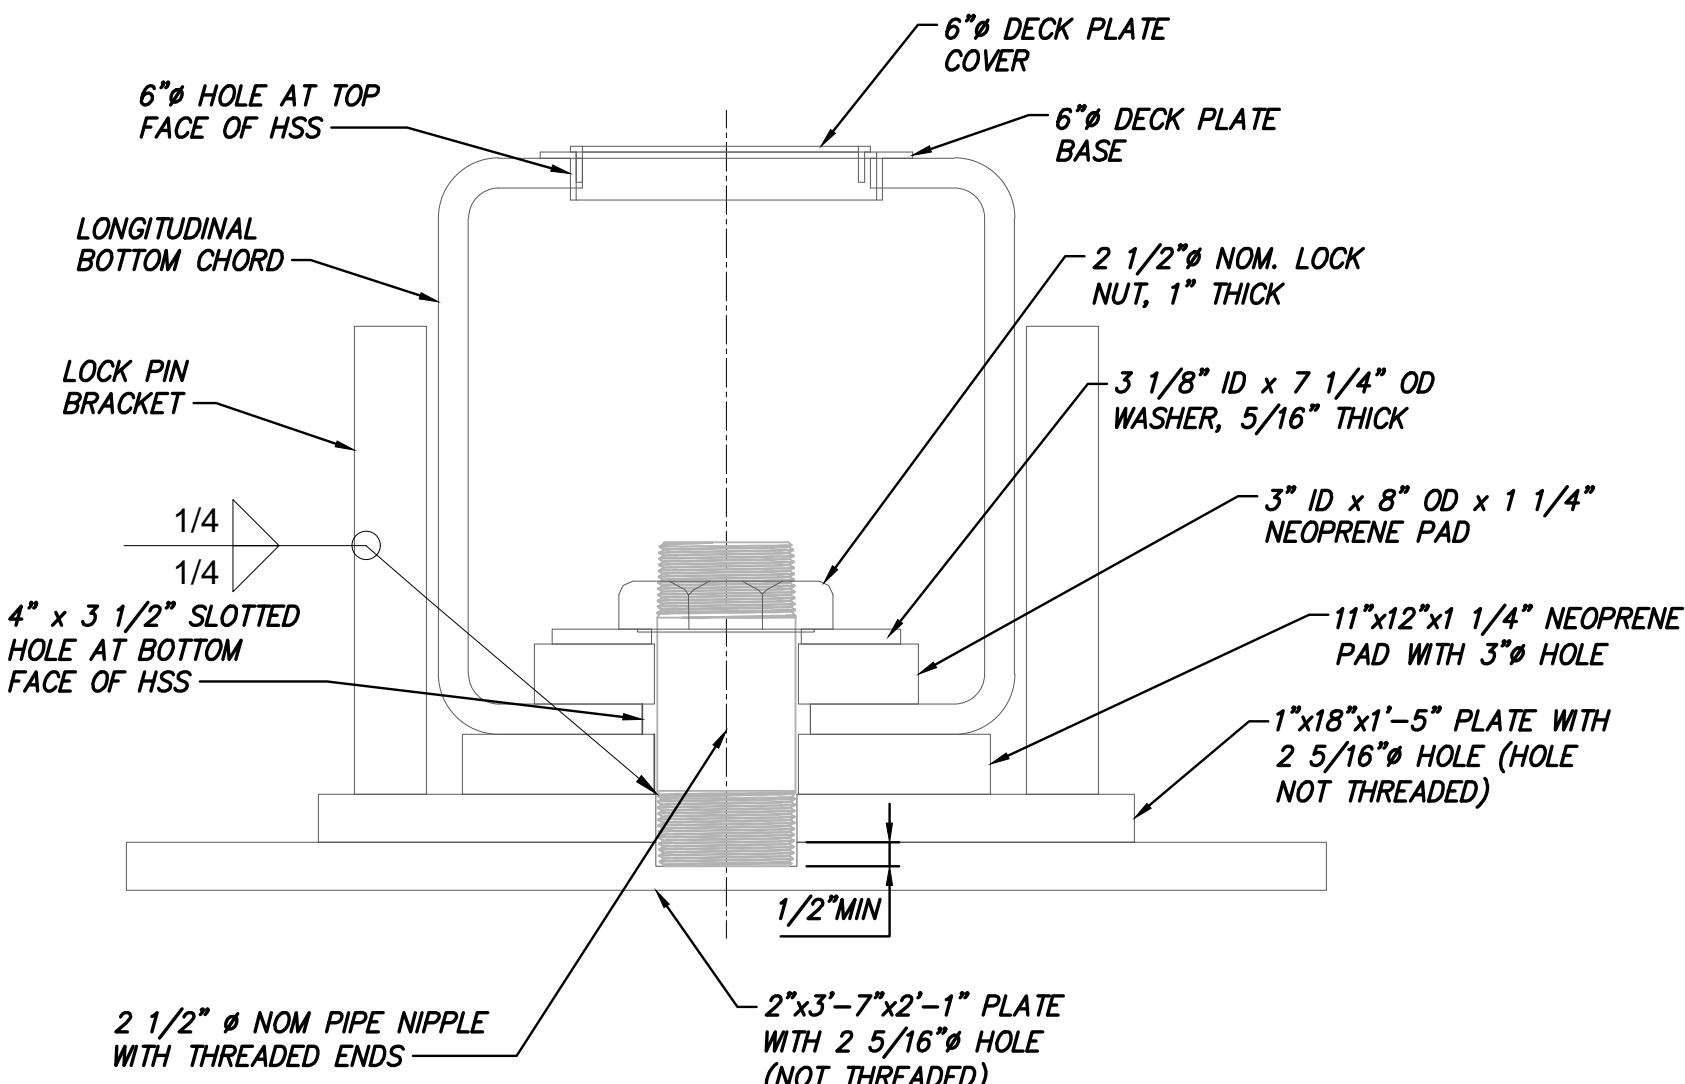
TYPICAL BEARING DETAIL AT PIERS - ELEVATION
